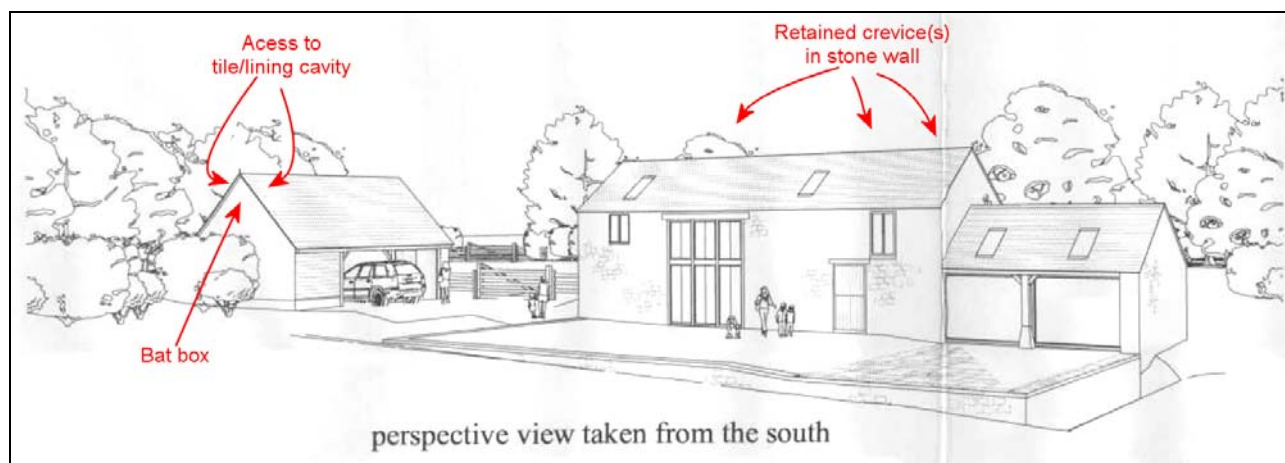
Proposed perspective view of the site showing the location of the proposed bat rooting features (from Stable Architecture Drawing No: 5353-03).
